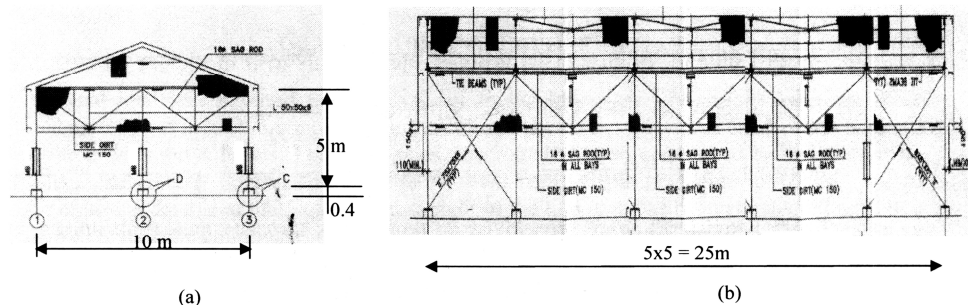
Details of typical industrial shed aimed to be replaced with bamboo.
